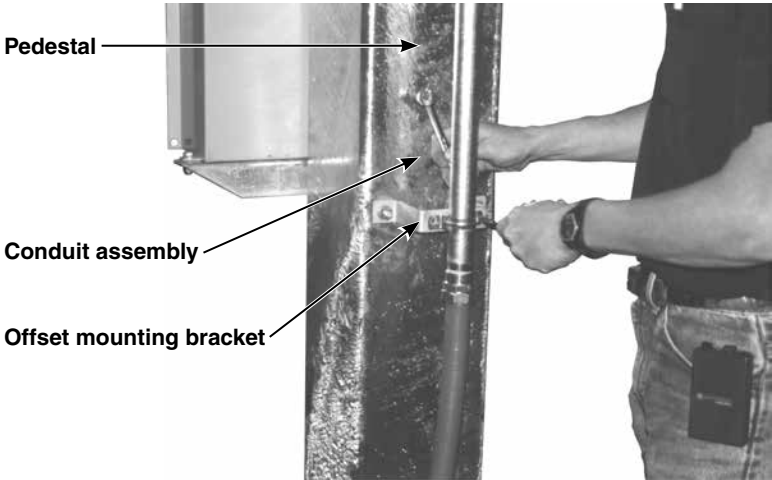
Using the offset mounting brackets, attach the conduit assembly to the pedestal.
